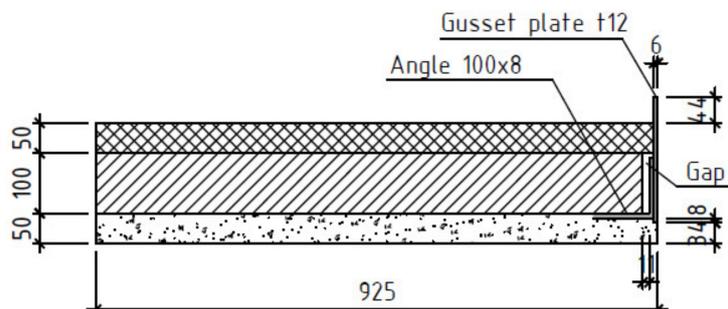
Calculation scheme with a gusset plate. Partial filling of the gap with thermal insulation between precast concrete elements and metal structures (units: mm).
